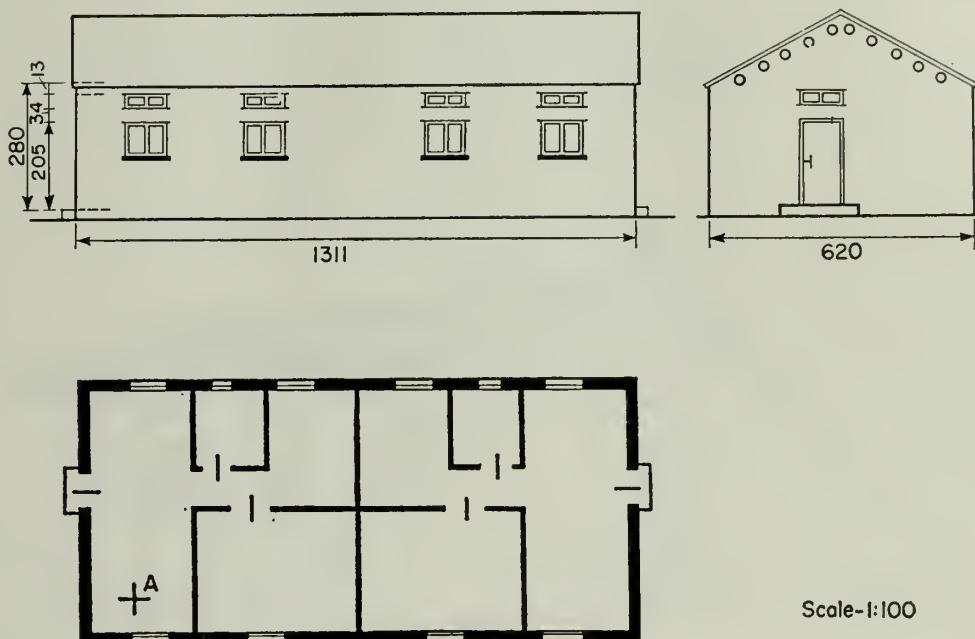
Ground plan of the house. Elevations of pitched roof houses
